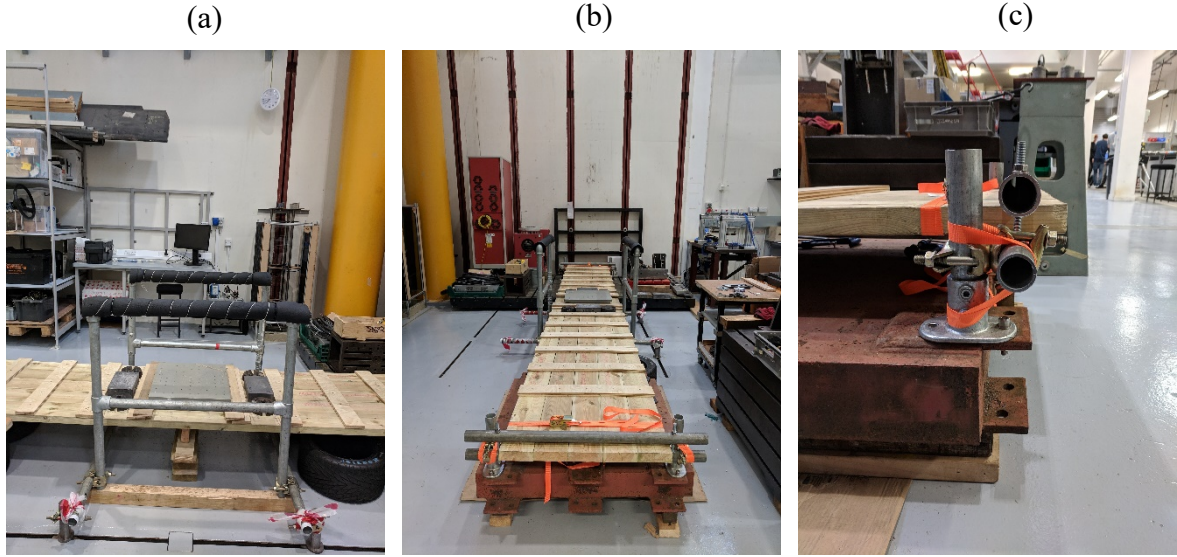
Breakdown of constructed bridge (a) Central jumping zone; (b) Length of bridge; (c) Bridge beam end-fixtures
